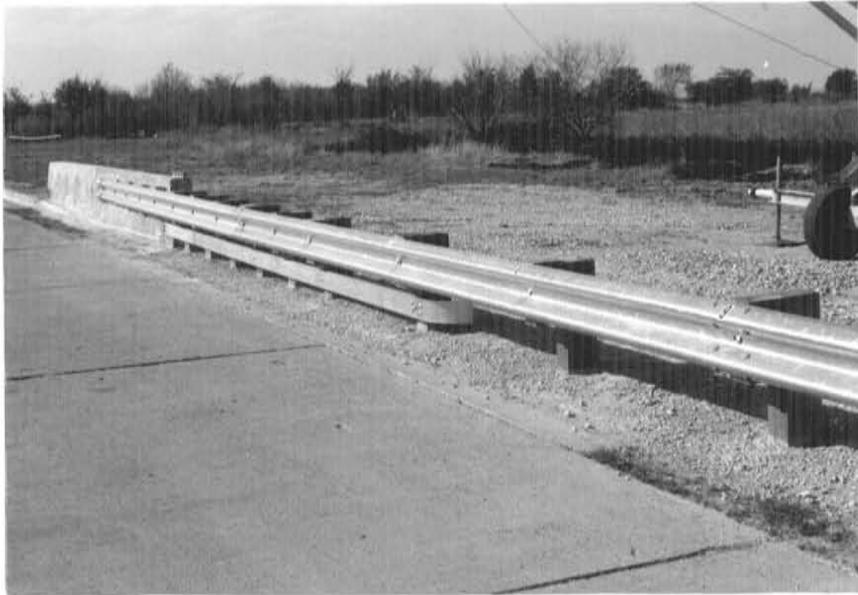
Arizona guardrail transition to concrete half barriers before test 7155-8.
